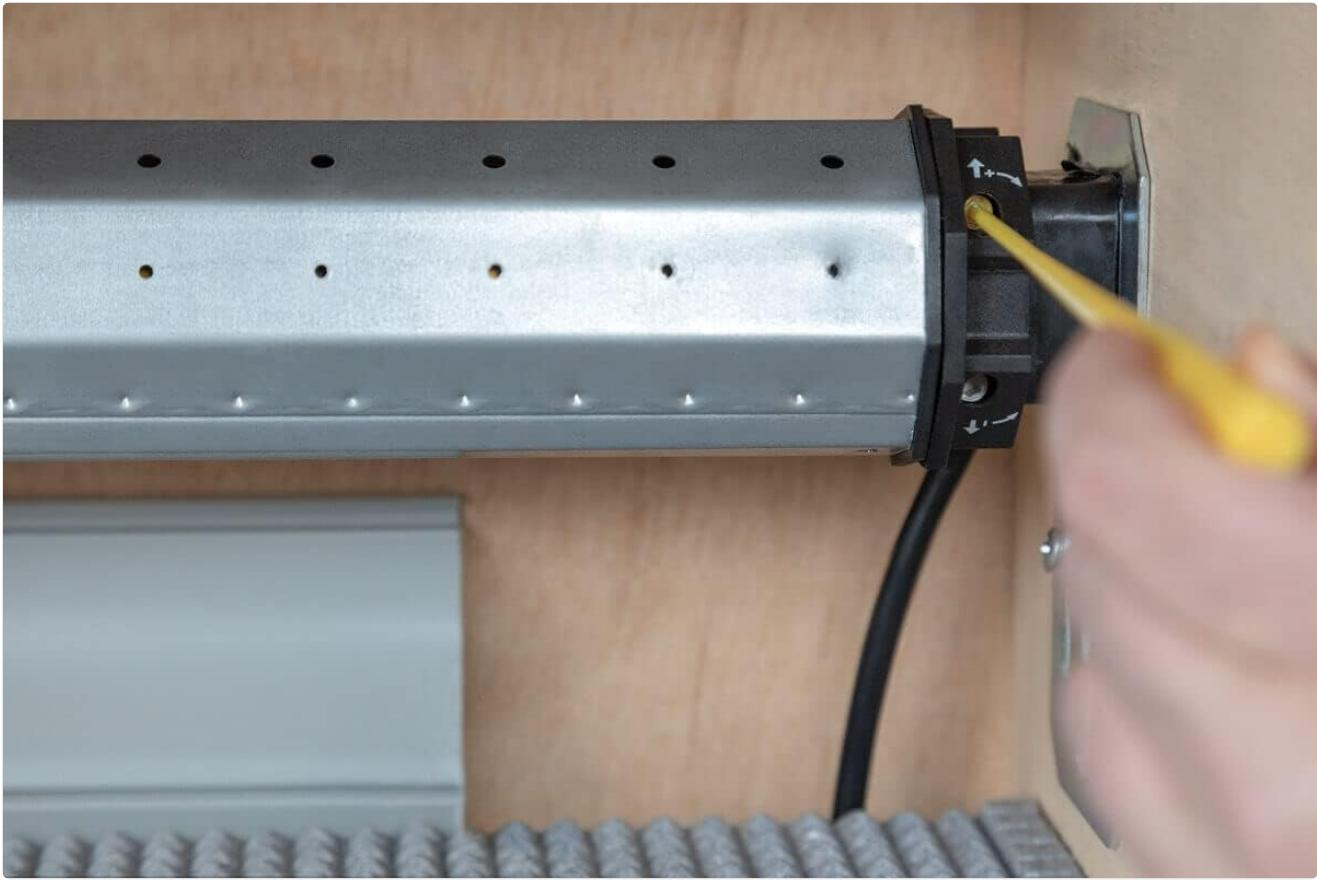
A hand using the adjustment tool to set the mechanical end stops on the tubular motor. The screws are typically located on the motor head.
